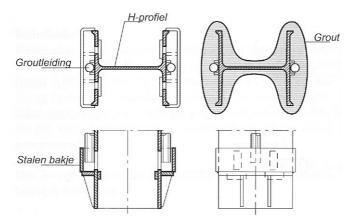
MV-pile cross-section (Handbook Quay Walls)
